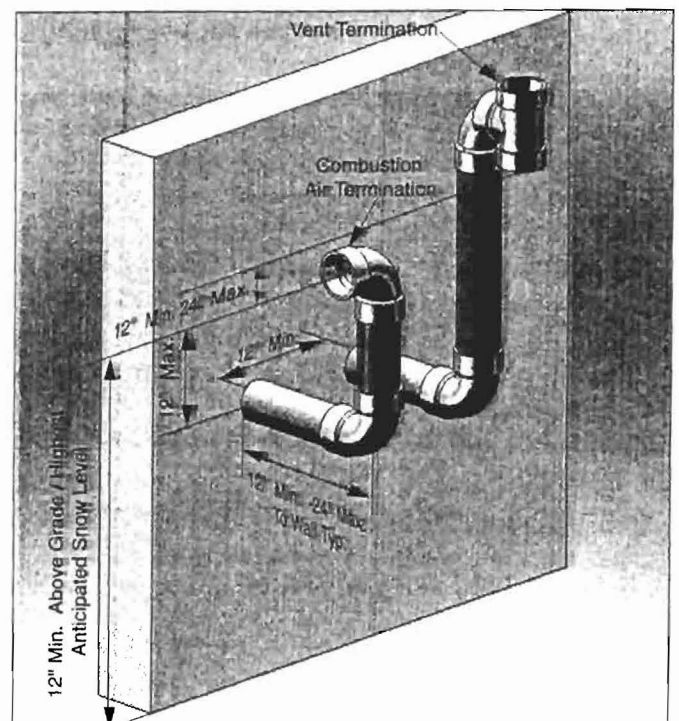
Direct Vent - Sidewall Snorkel Termination of Vent and Combustion Air Piping with Tee Vent Termination
